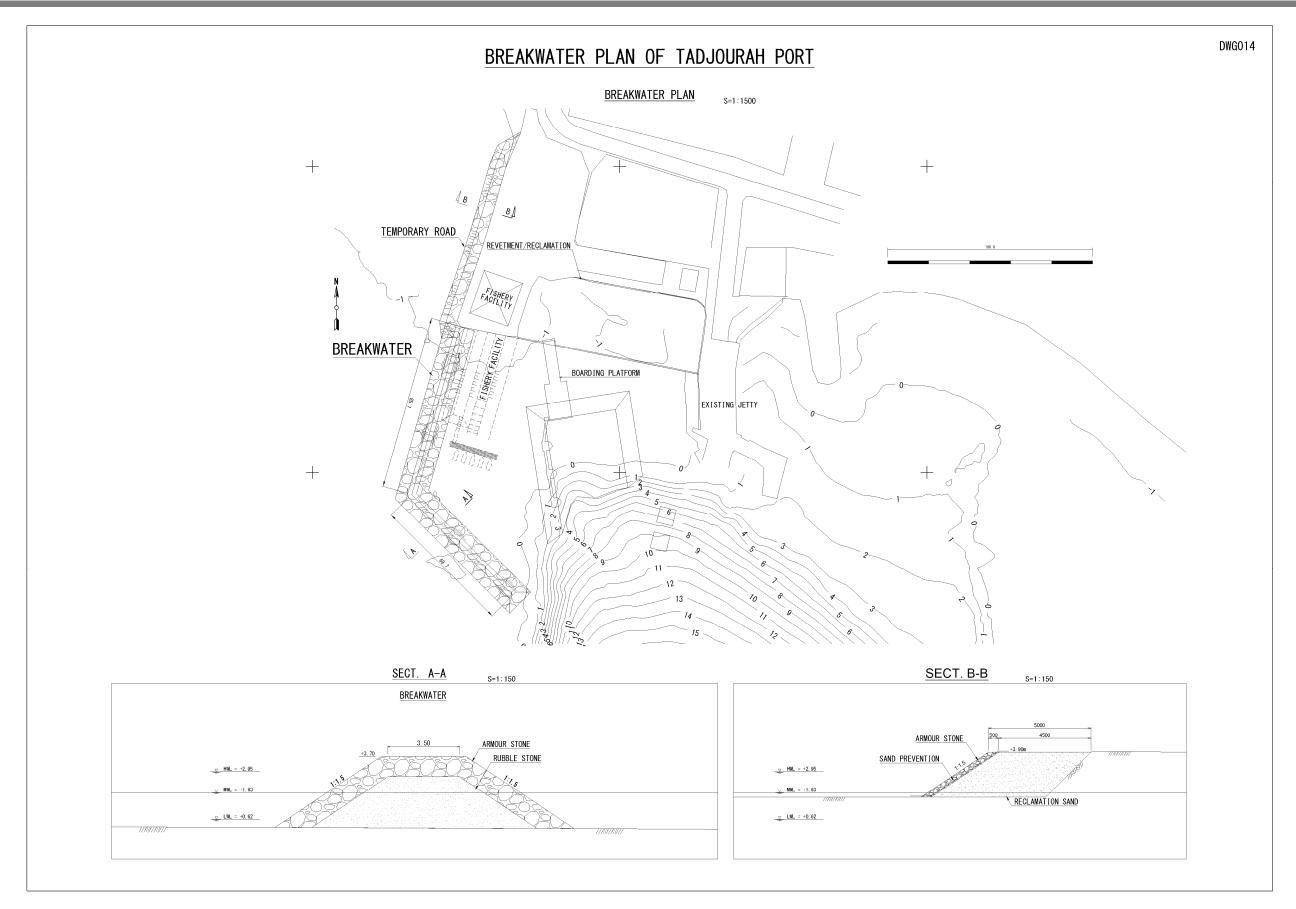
Breakwater Plan of Tadjourah Port
